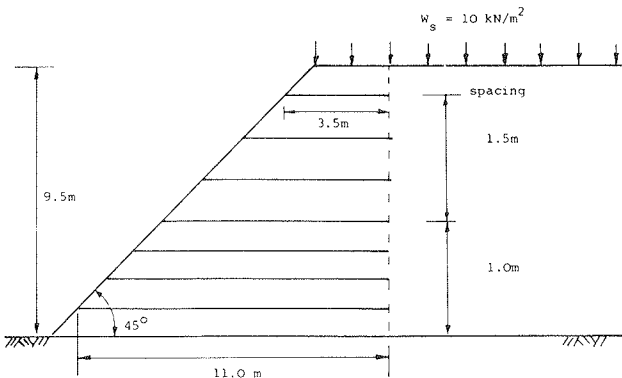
Reinforcement arrangement for slope at Brampton, Ontario. [After Devata, 1984]
